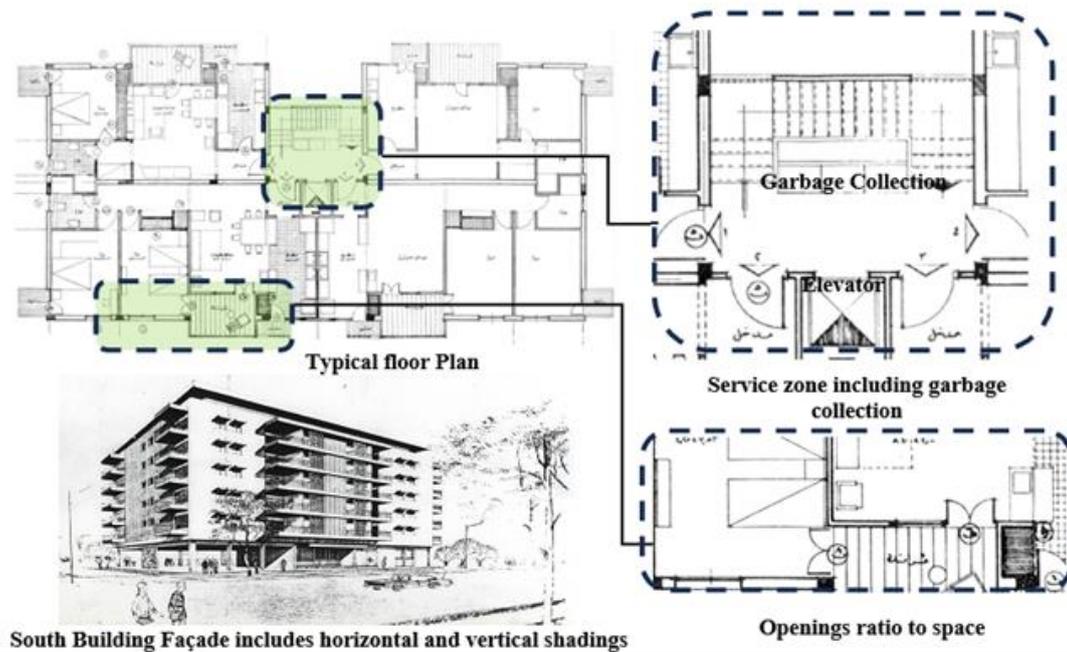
Laila Murad Apartment building by Sherif Noaman [17]
